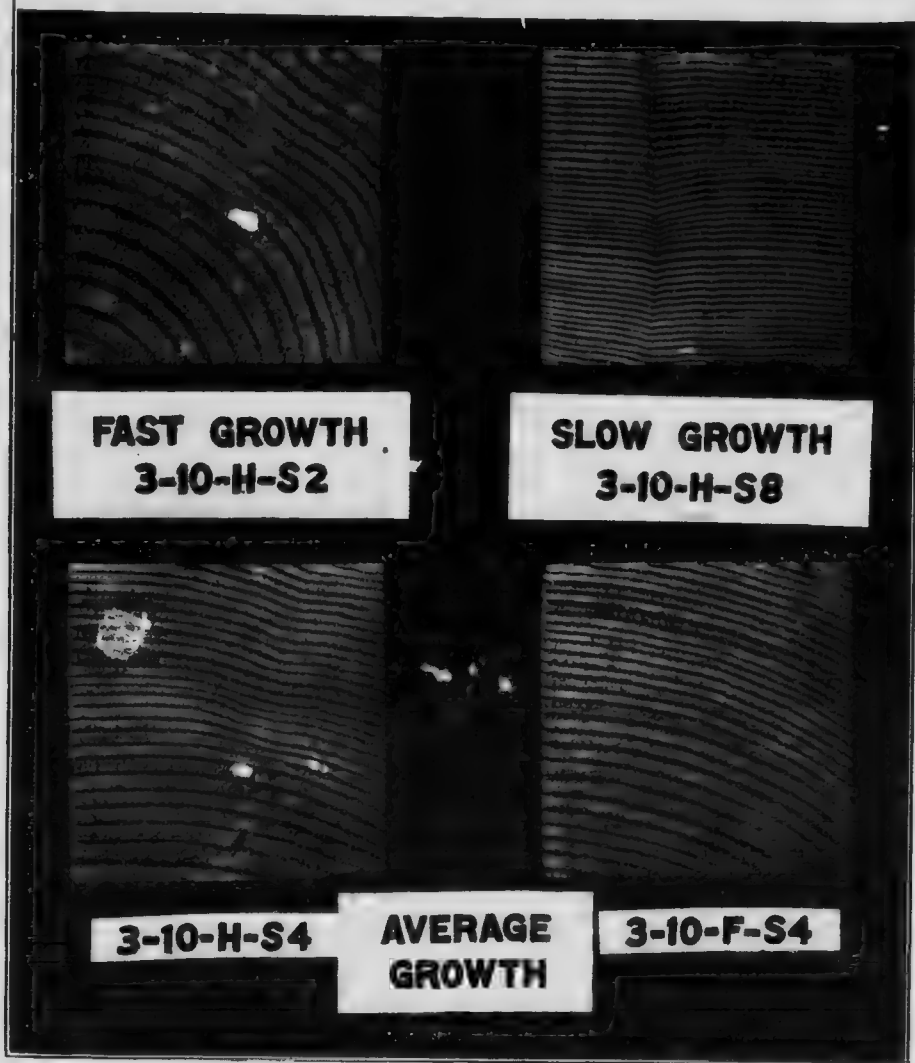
Cross-sections of specimens shown in Figs. 17 and 18.
